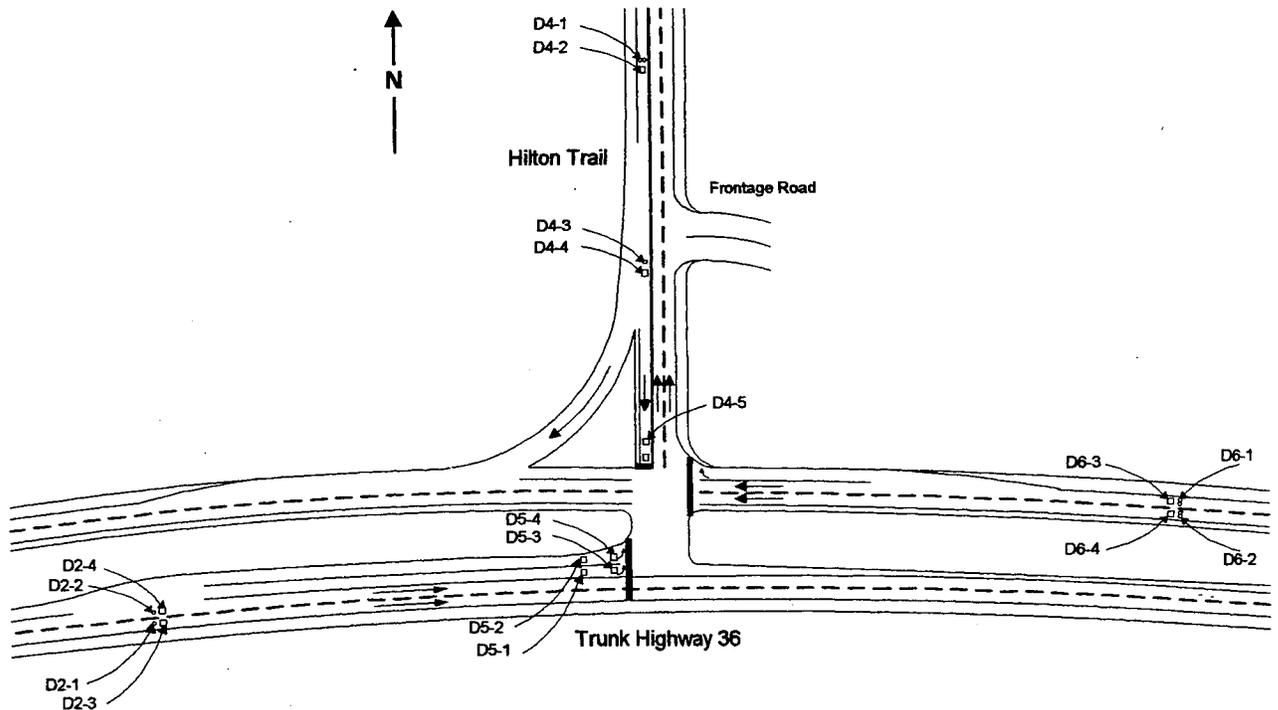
Intersection Layout - TH 36 at Hilton Trail, Pine Springs, Washington County (not to scale)
